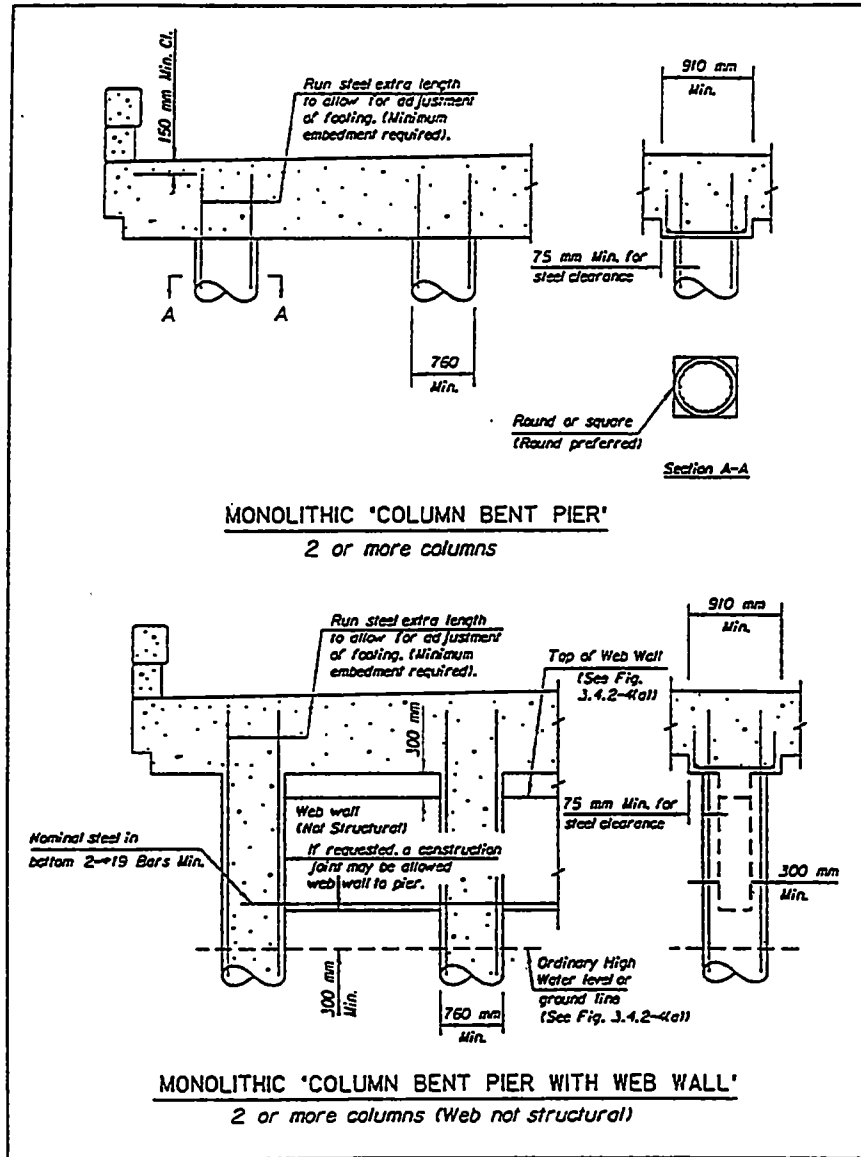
Column Bent Pier with Web Wall (from Kansas Department of Transportation, 1999)
